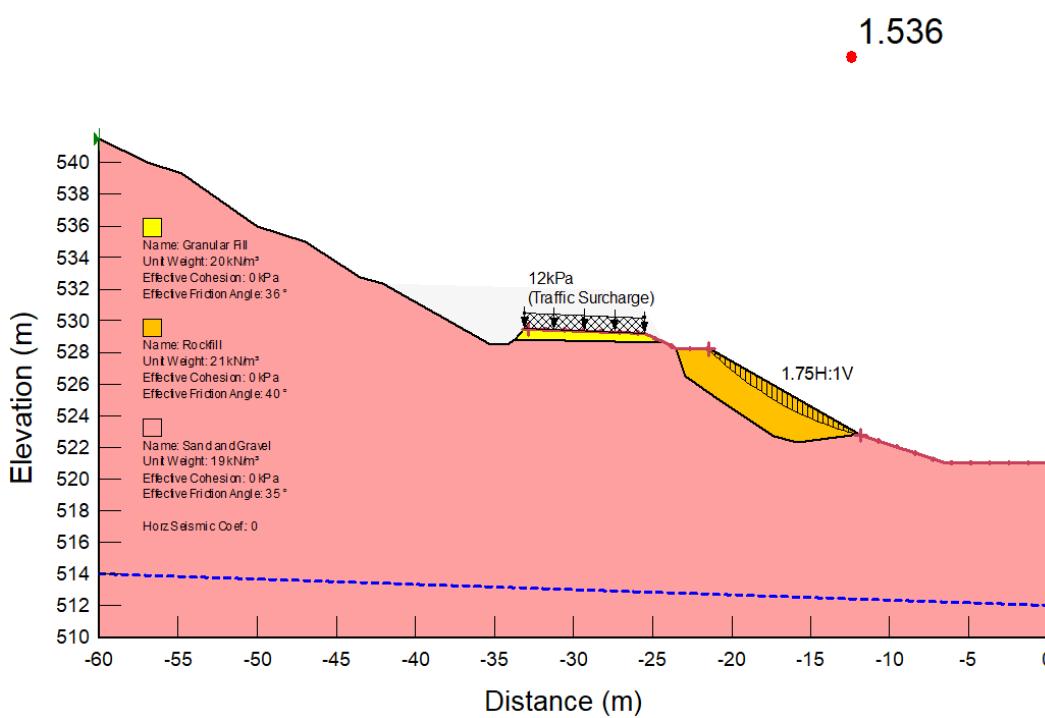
1.75H:1V Rockfill Slope of Option 2 Design Cross Section at Station 101+40 under Static Loading Conditions.
